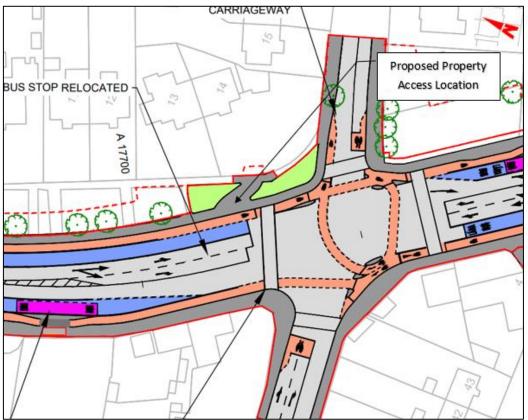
Extract from General Arrangement Drawings showing Access to 14 Dublin Road (Sheet 50)
